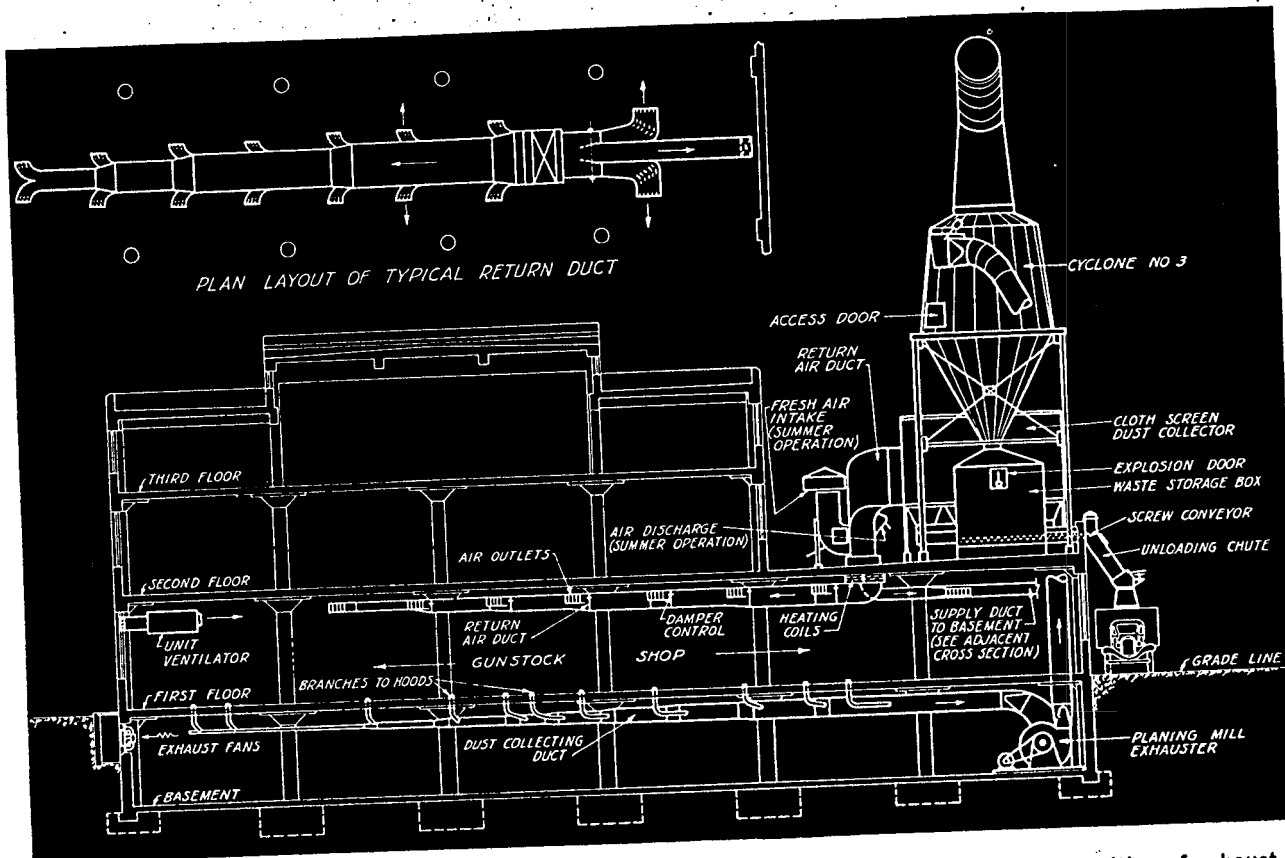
Cross section showing the arrangement of collecting equipment on roof and relative position of exhaust piping and return ducts; also return duct detail.
